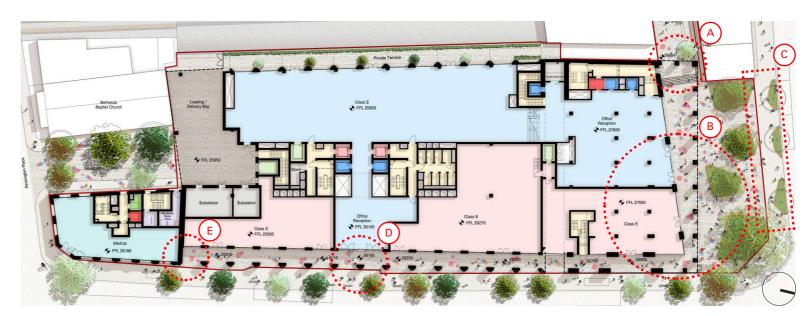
Illustrative Ground Floor Plan with Internal Street presented at QRP 2
